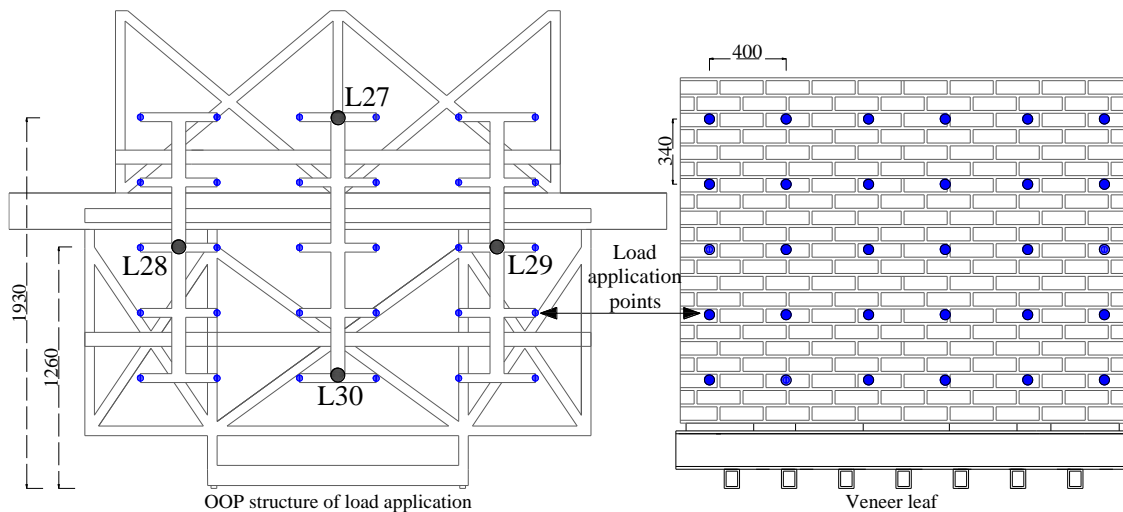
Load application points layout scheme on structure and veneer leaf
